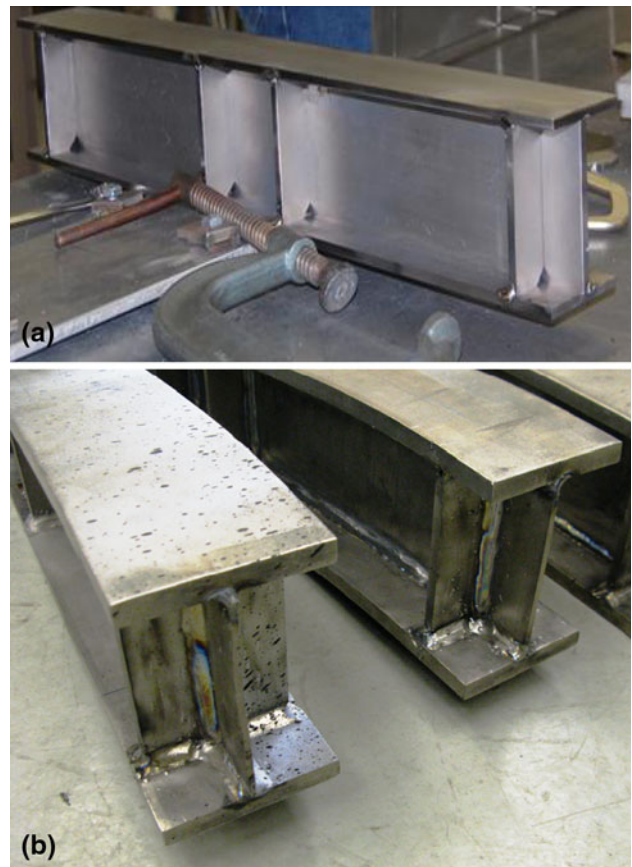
(a) A typical tack-welded titanium test beam. (b) Fully welded test beams of CP titanium (Grade 2)
